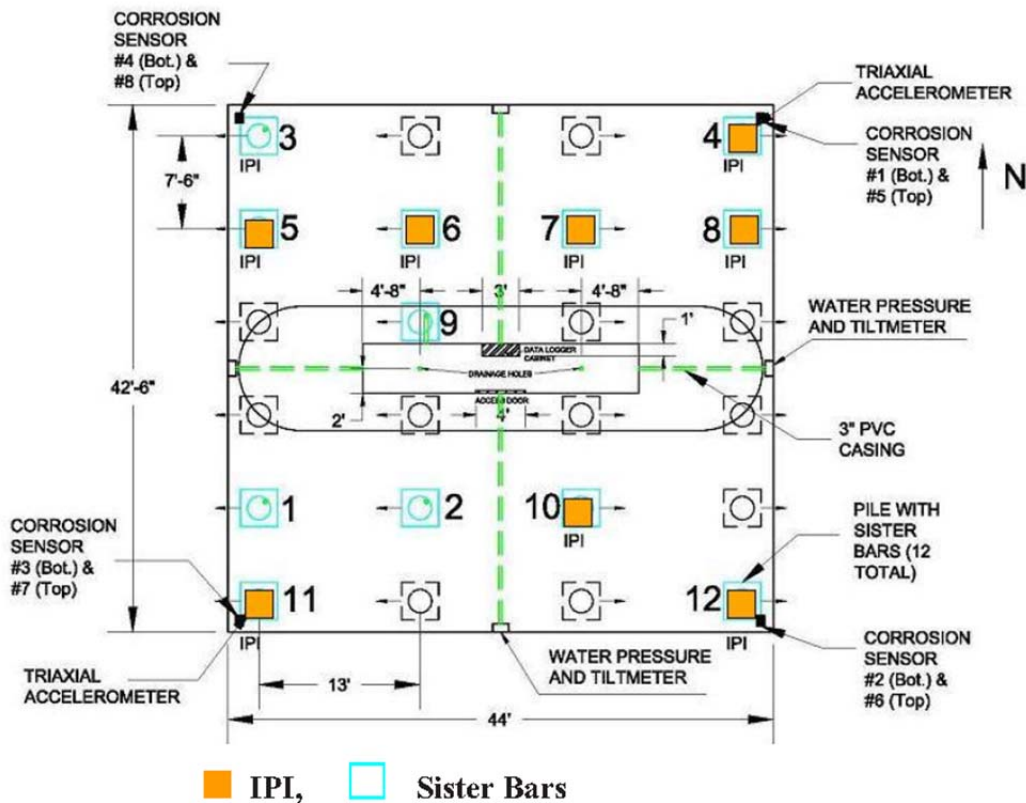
Instrumentation on piles and pile cap (Abu-Farsakh et al. 2010)
